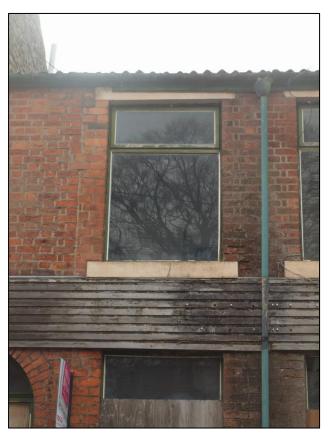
Detail of first floor windows of 5 Queens Road showing straight joint
